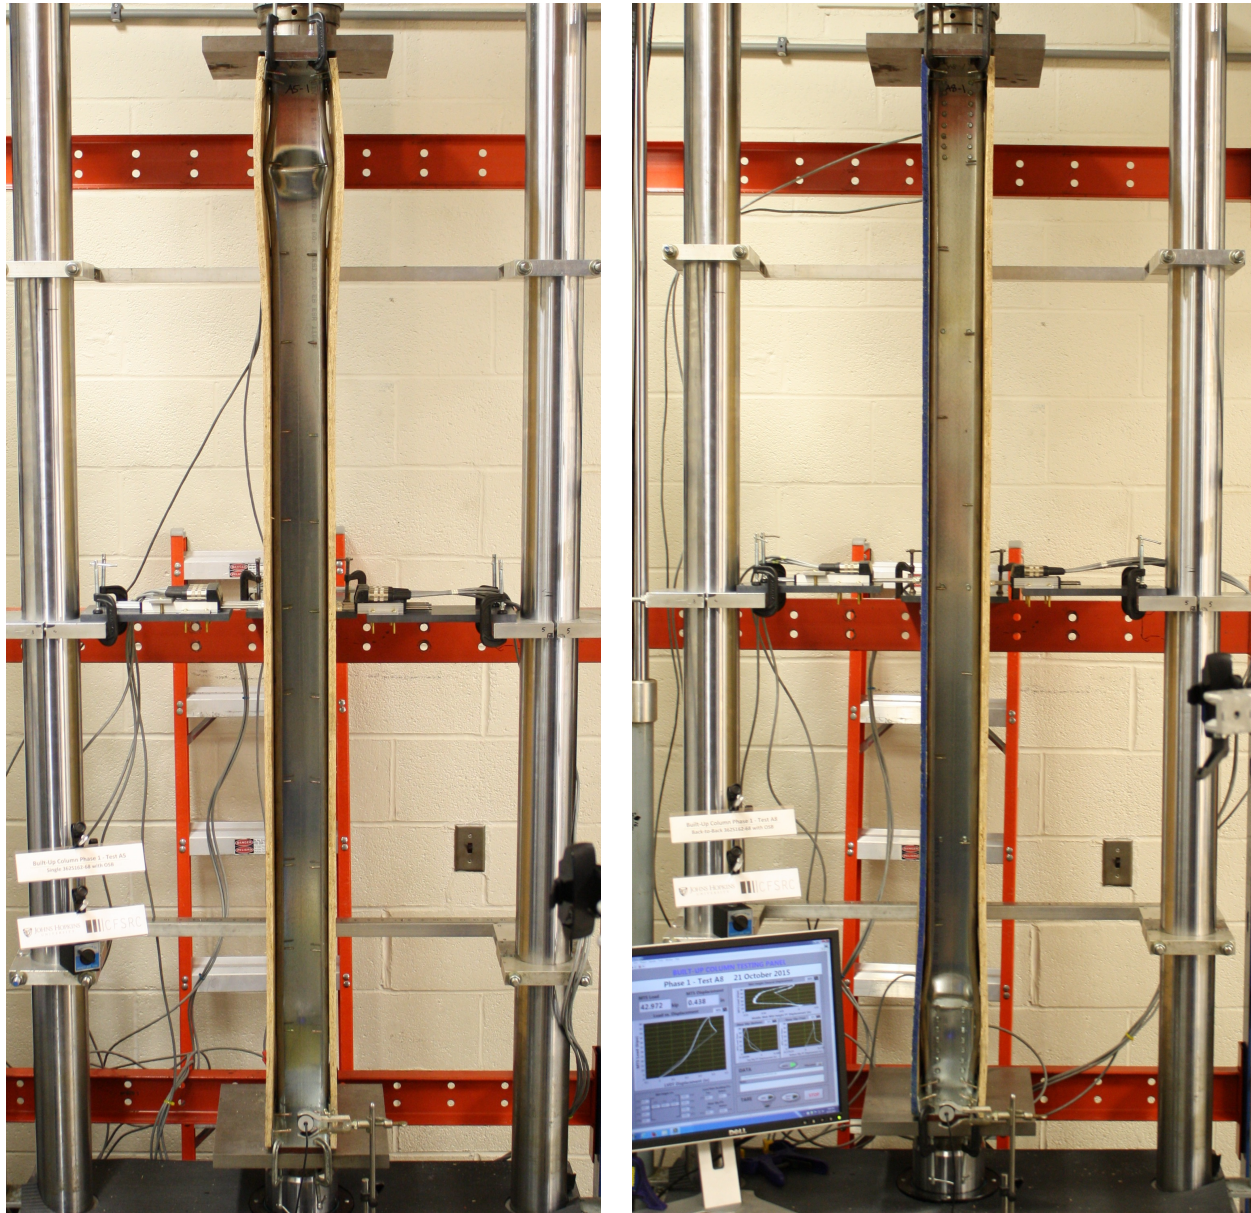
Typical single stud (left, trial A5) and built-up column (right, trial A8) web local buckling failures
